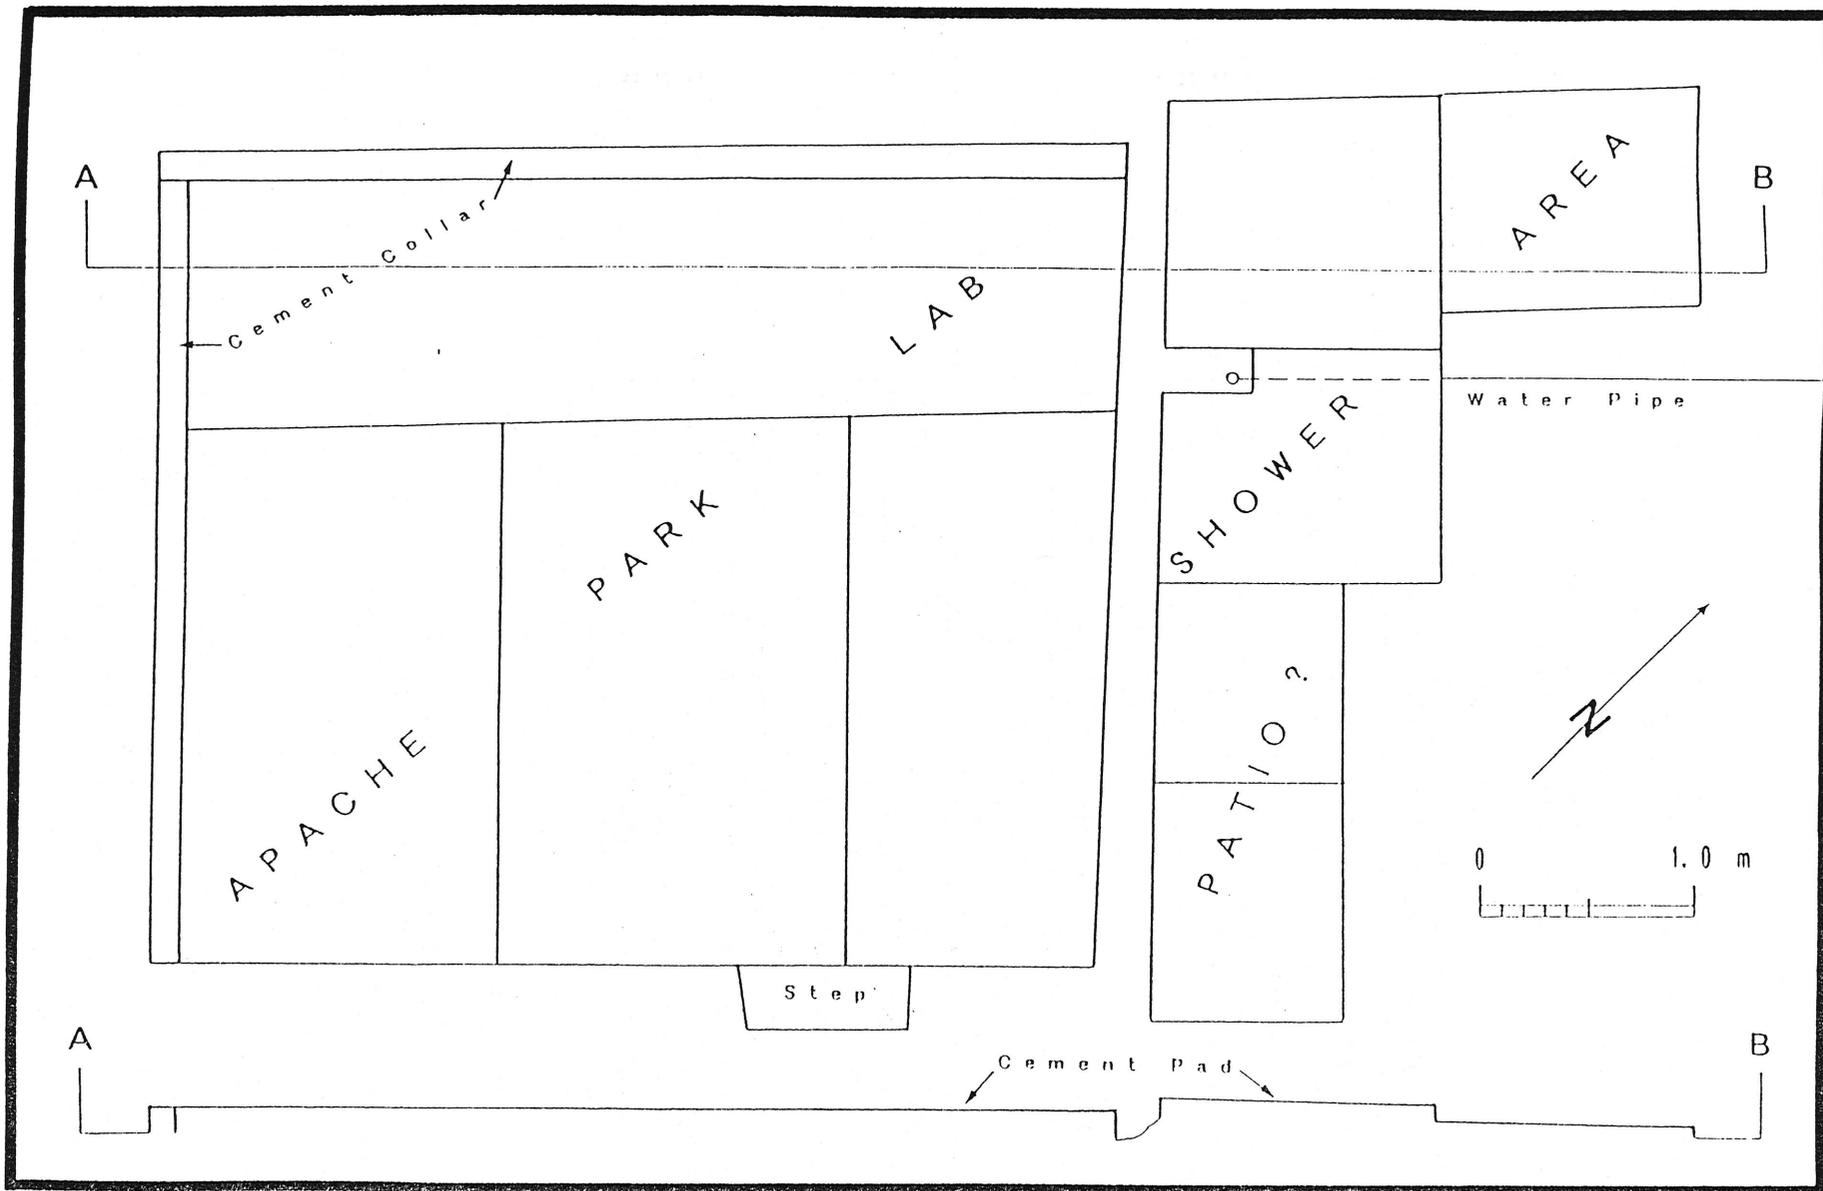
Concrete floor plan and profile of the Apache Park Laboratory and, presumably, its adjacent shower area.
